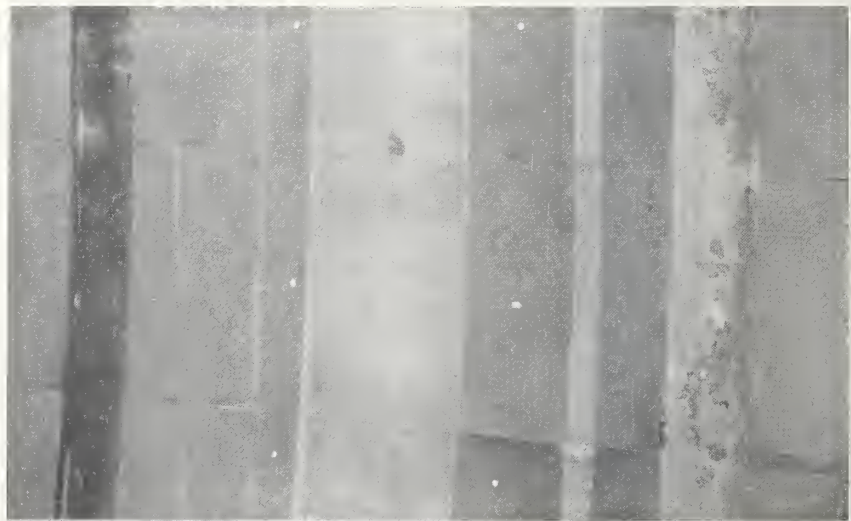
$\frac{1}{8}$ -in. asphalt tile on concrete subfloor (test panel 19R).
